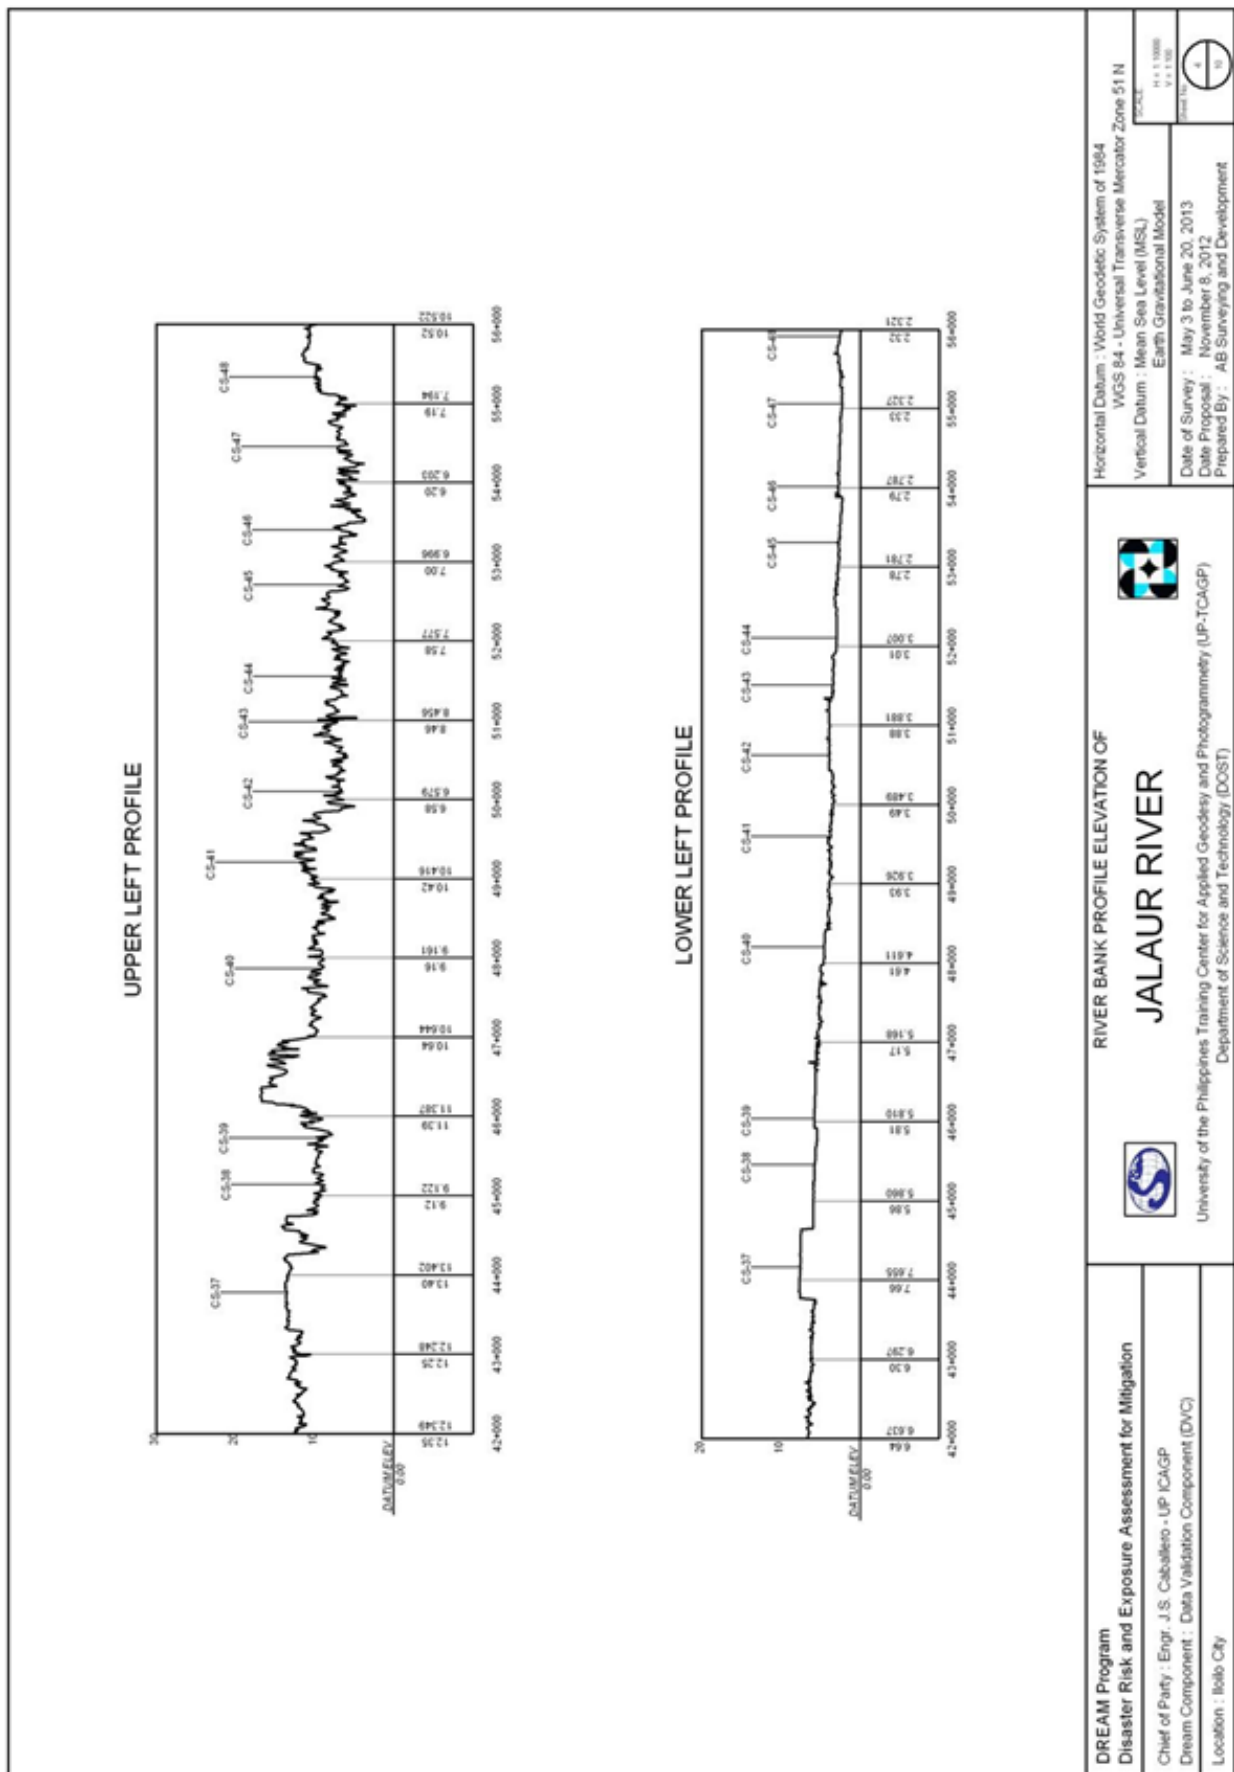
Sheet No. 4 Left River bank profile with relative location of bridge and cross-section
